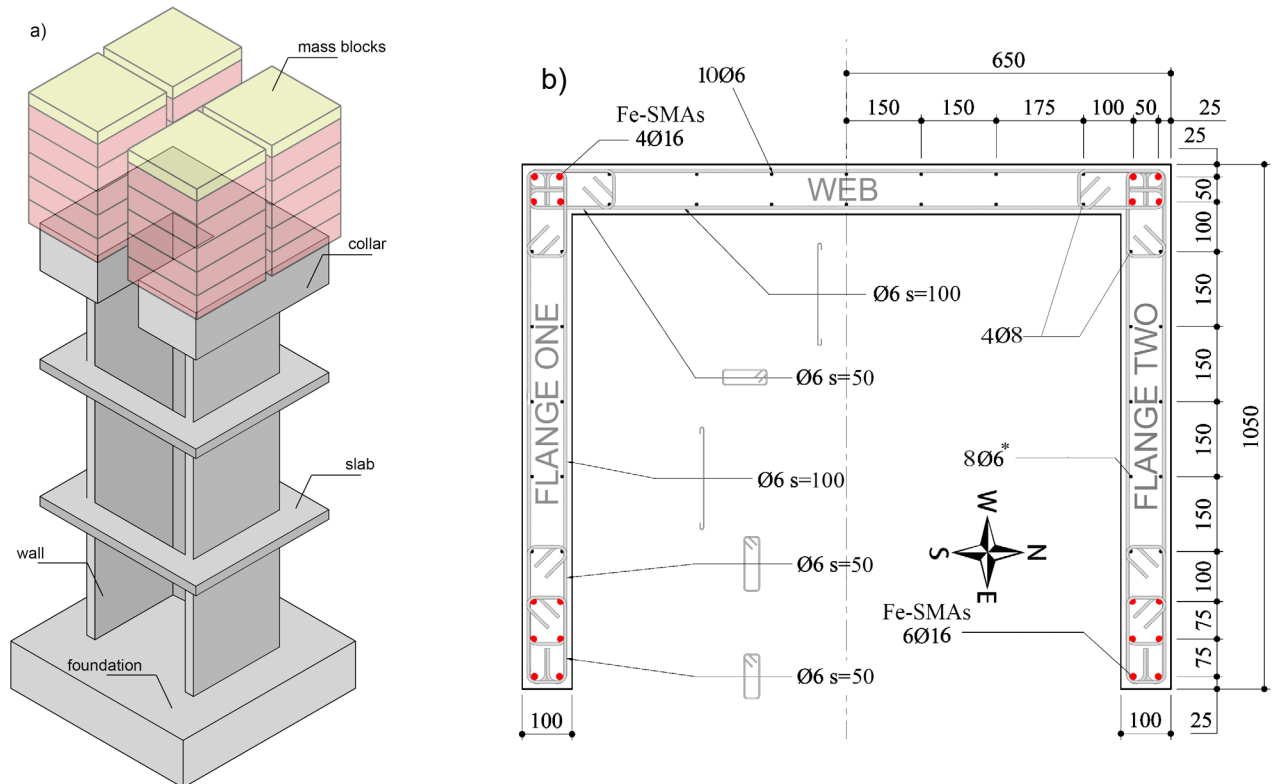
Unit UWS2 (a) three-dimensional elevation view with mass blocks and (b) cross-section and reinforcement detailing (red-shaded bars indicate Fe-SMA rebars) (dimensions in mm)
